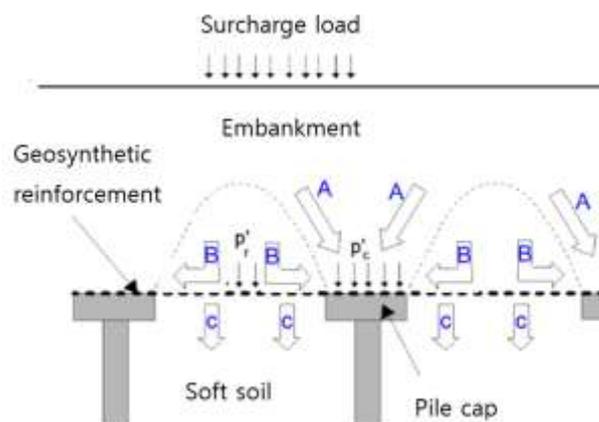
Load transfer mechanism in a piled embankment (Van Eekelen 2008)
